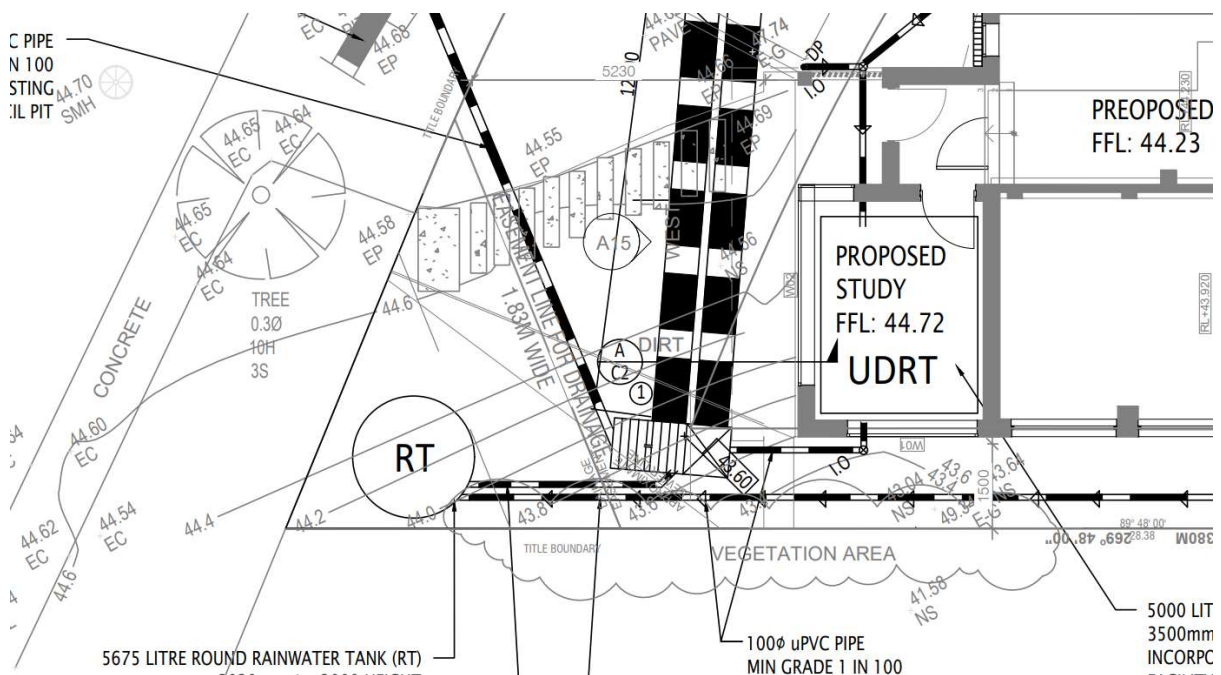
Stormwater and Rainwater assets 'floating' over retaining wall
